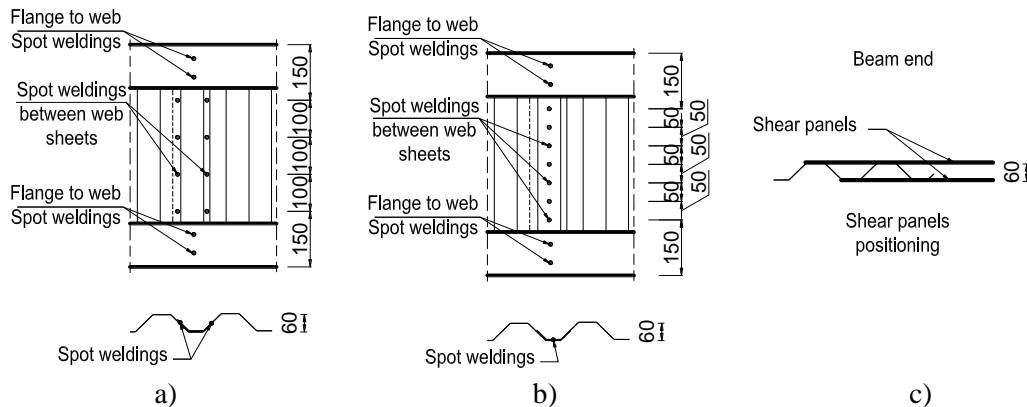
a) Connection between corrugated sheets of beam CWB SW-1, b) Connection between corrugated sheets of beam CWB SW-2, c) position of the shear panels.
